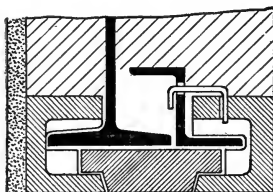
Lintel Section, Court Opening. Cable Building.
